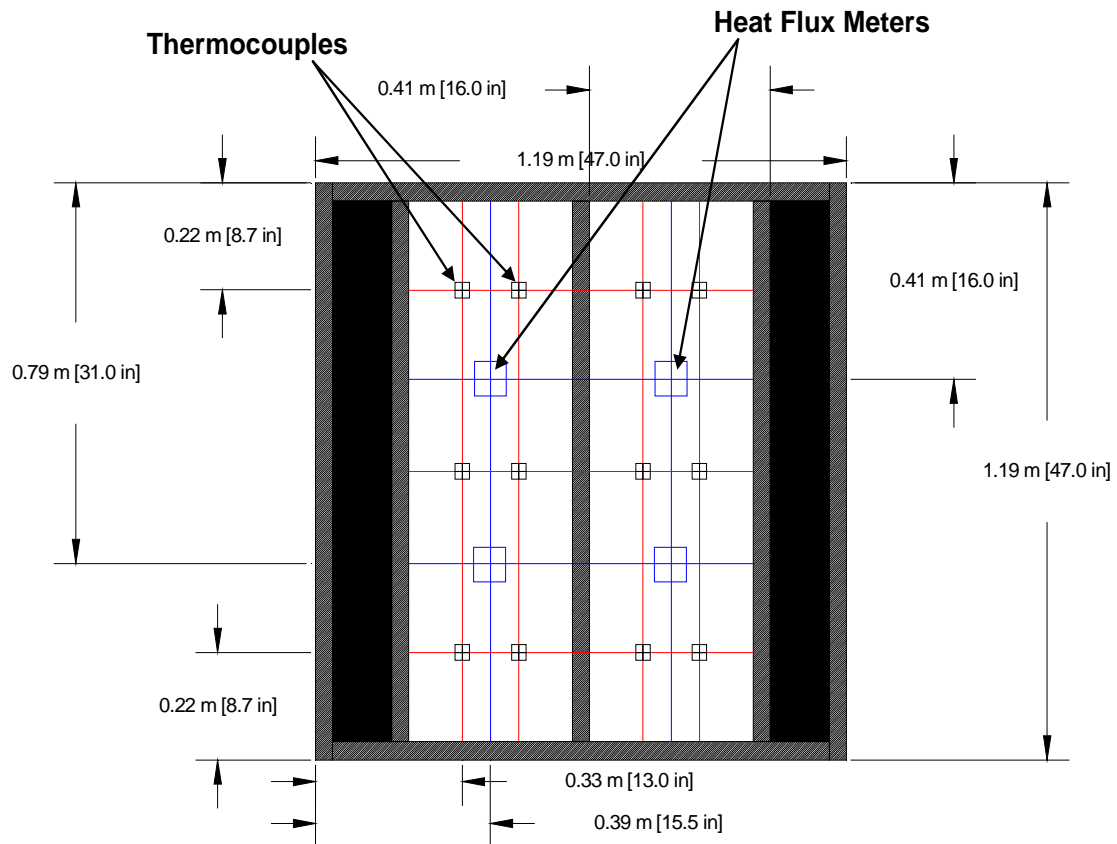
Arrangement of Thermocouples and Heat Flux Meters on Exterior Wall Surface
